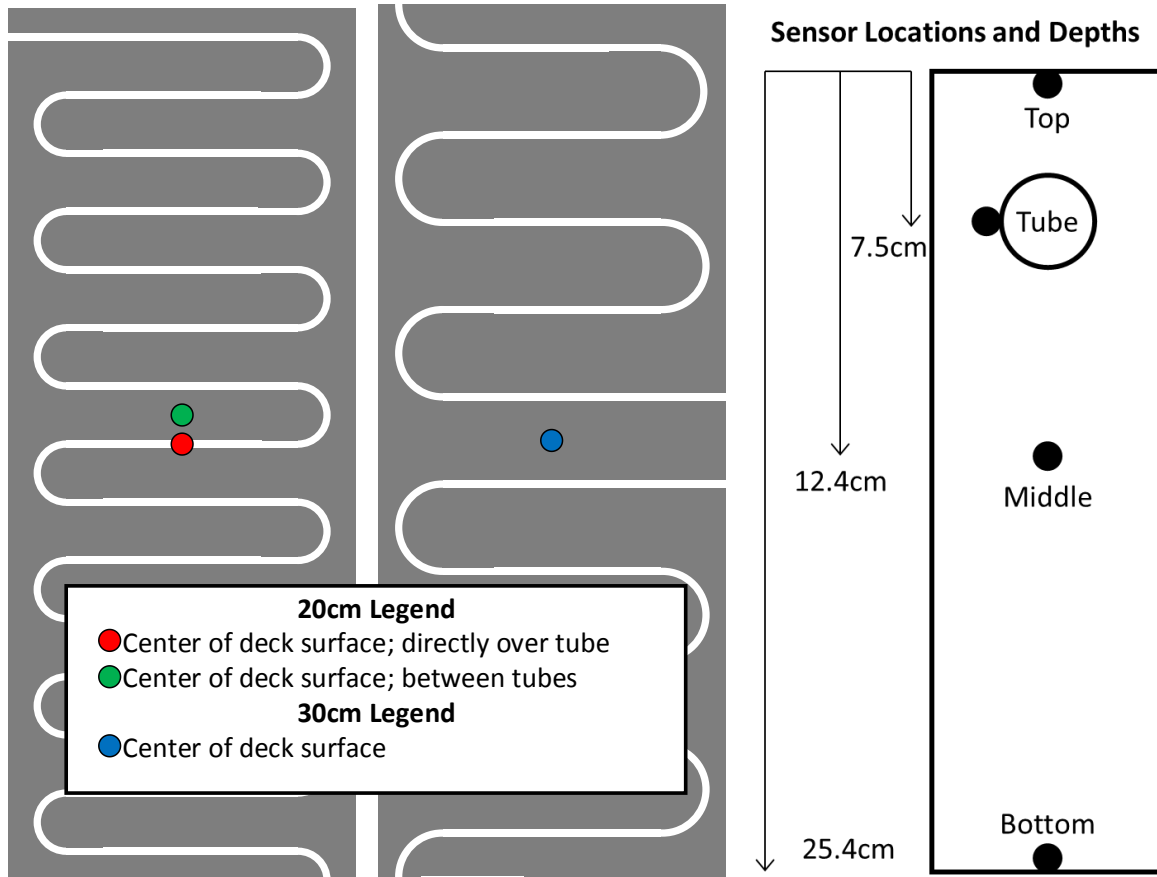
A plan and cross section view of the bridge deck showing the locations of the temperature sensors whose measurements are reported in this paper.
